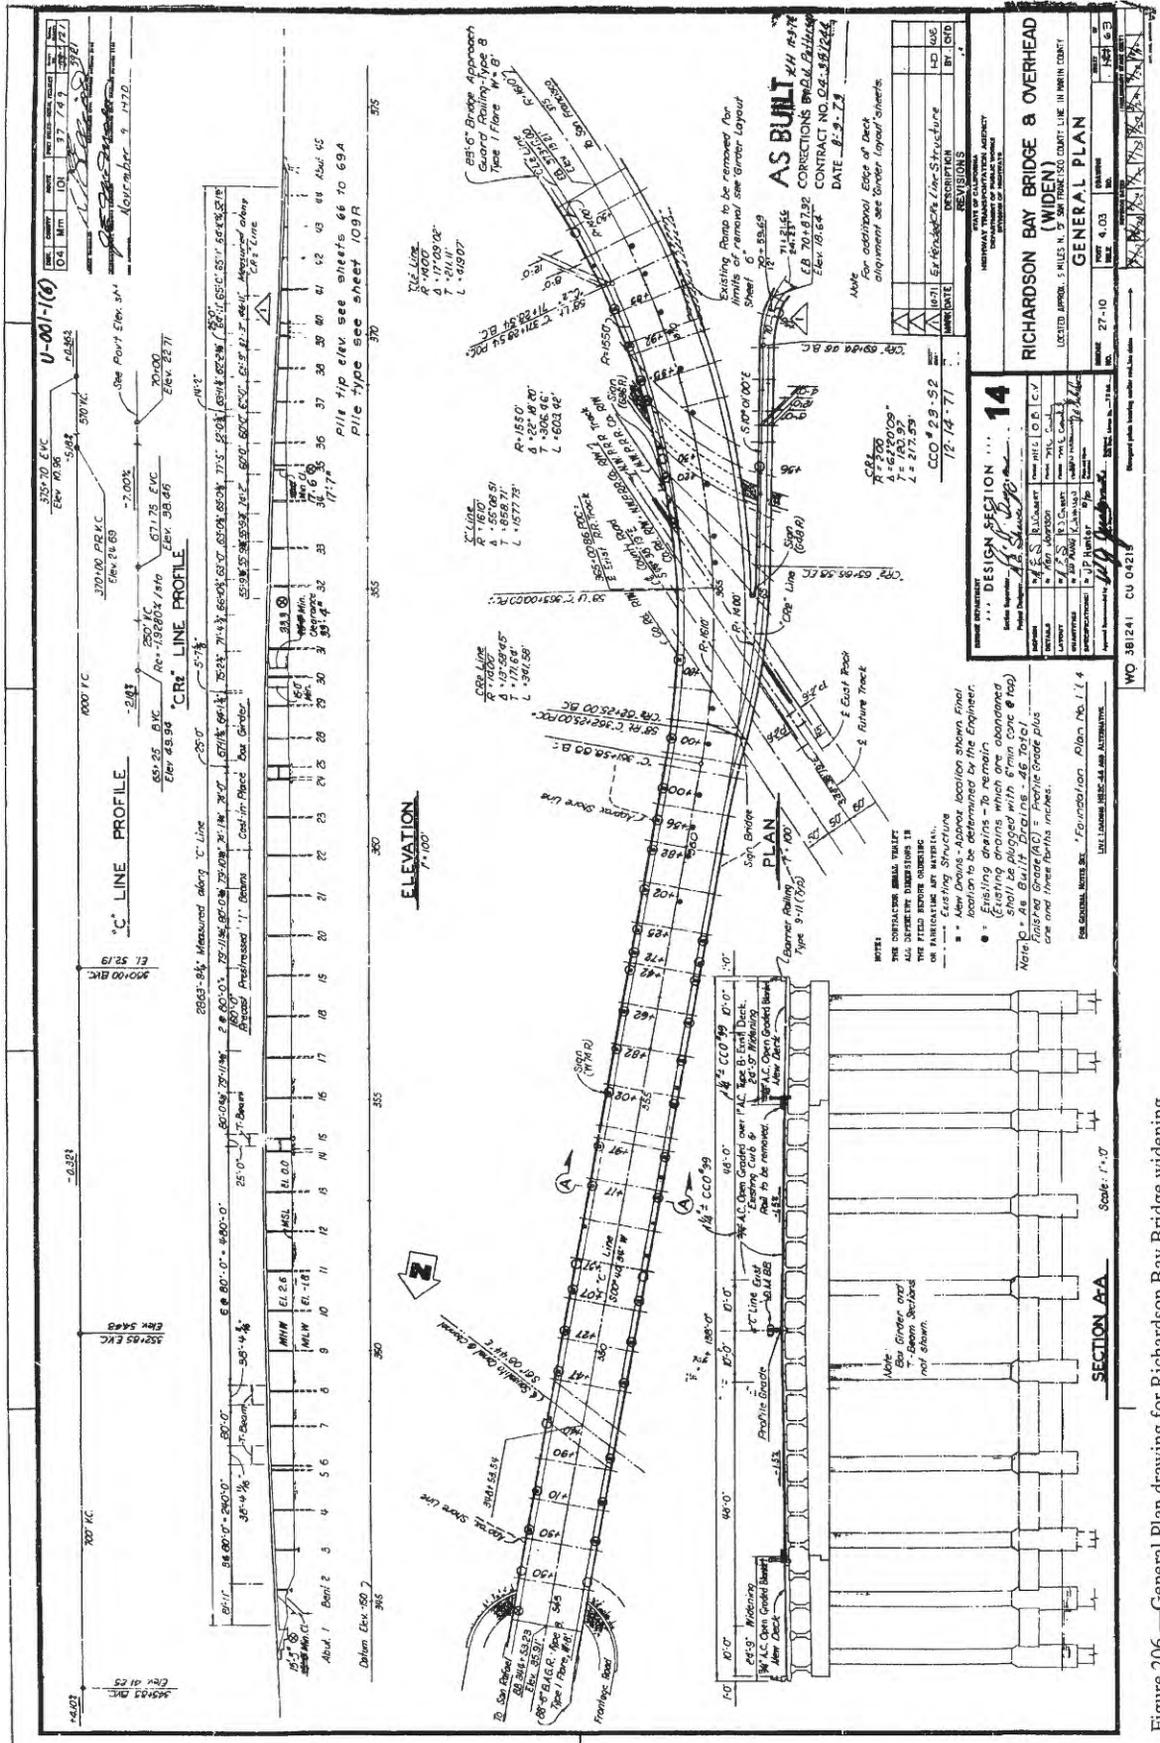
General Plan drawing for Richardson Bay Bridge widening.
